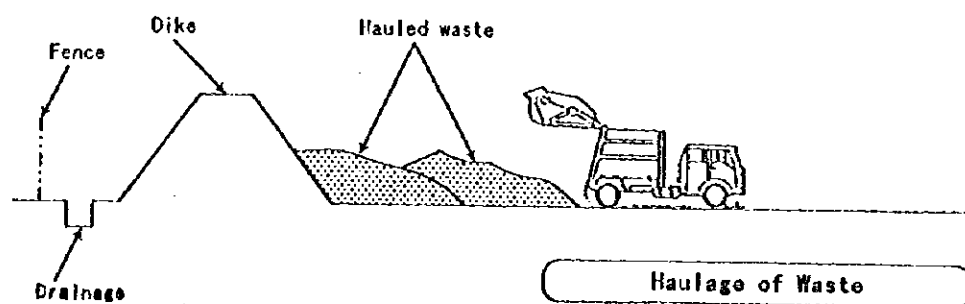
Typical Facilities of Lahmidate Disposal Site (1/2)
